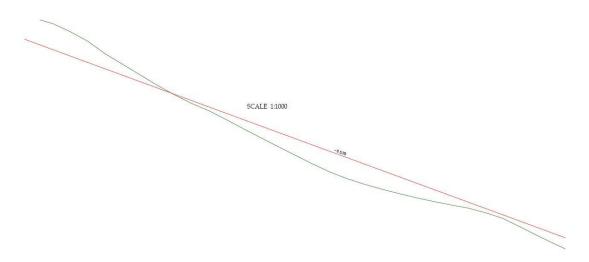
Vertical profile of non-corrugated pavement section (68+400 km)
